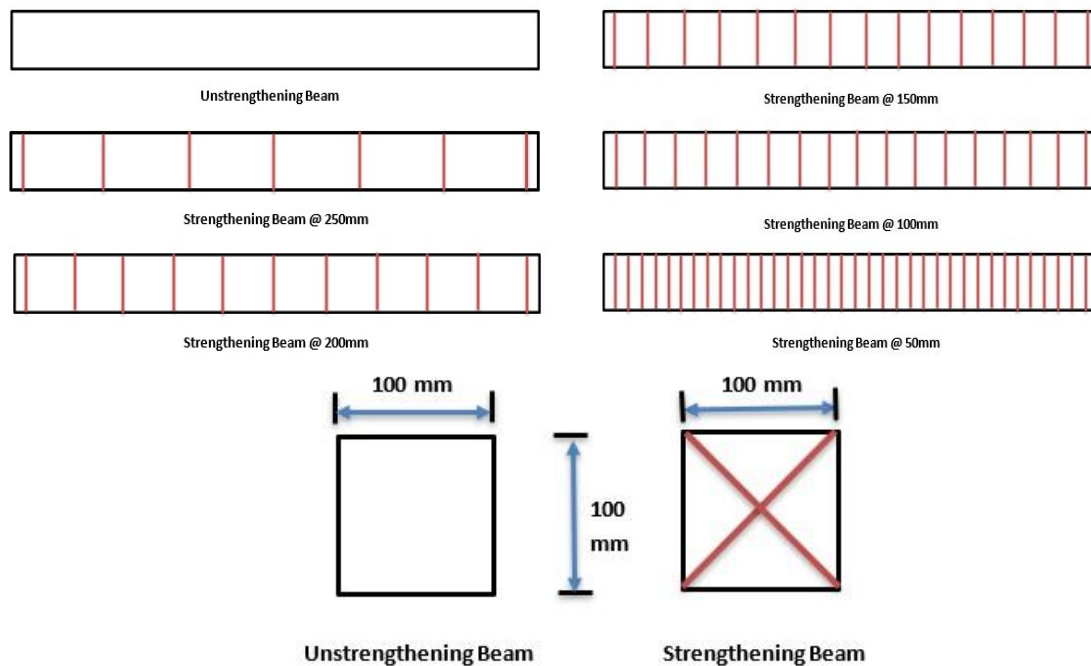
Reference Beam and Specifications for the Internal Cross-Rebar Steel Reinforcing.
